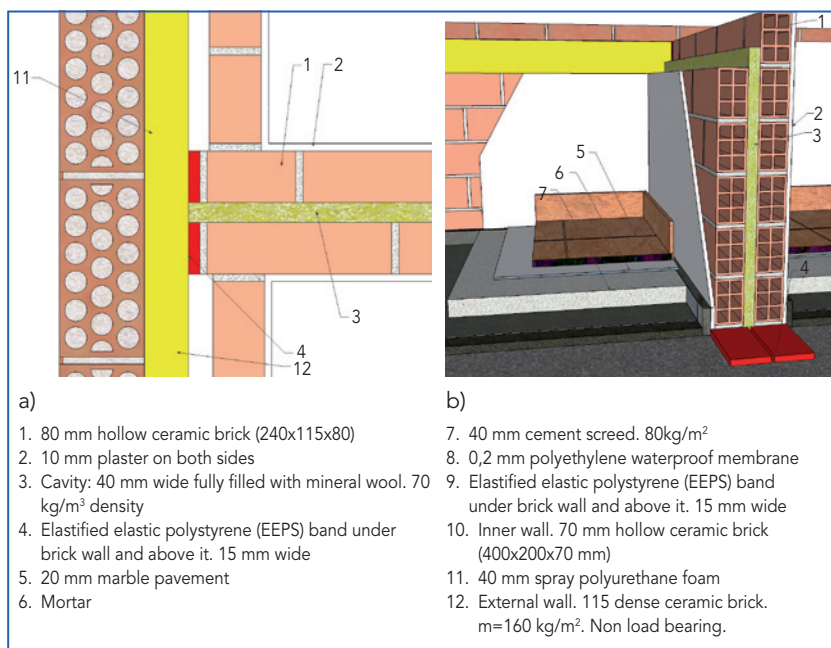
Example of Type 2 separating wall. Cavity wall.
